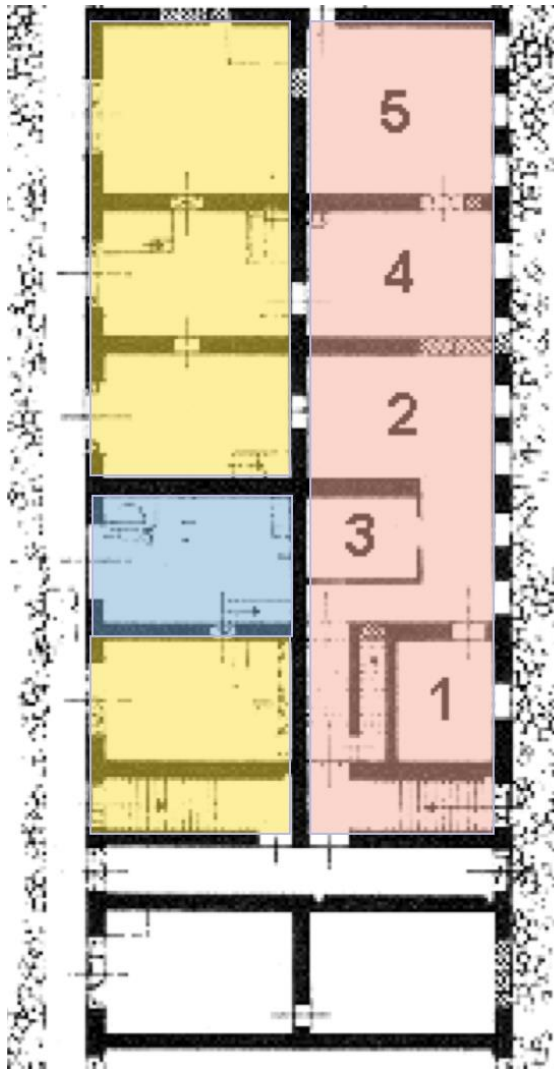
Floorplan of the House of the Painted Ceiling. The private rooms, shops, and bar are color-coded according to the key. Note that the bar is across from Rooms 1 and 3 within Room 2.
